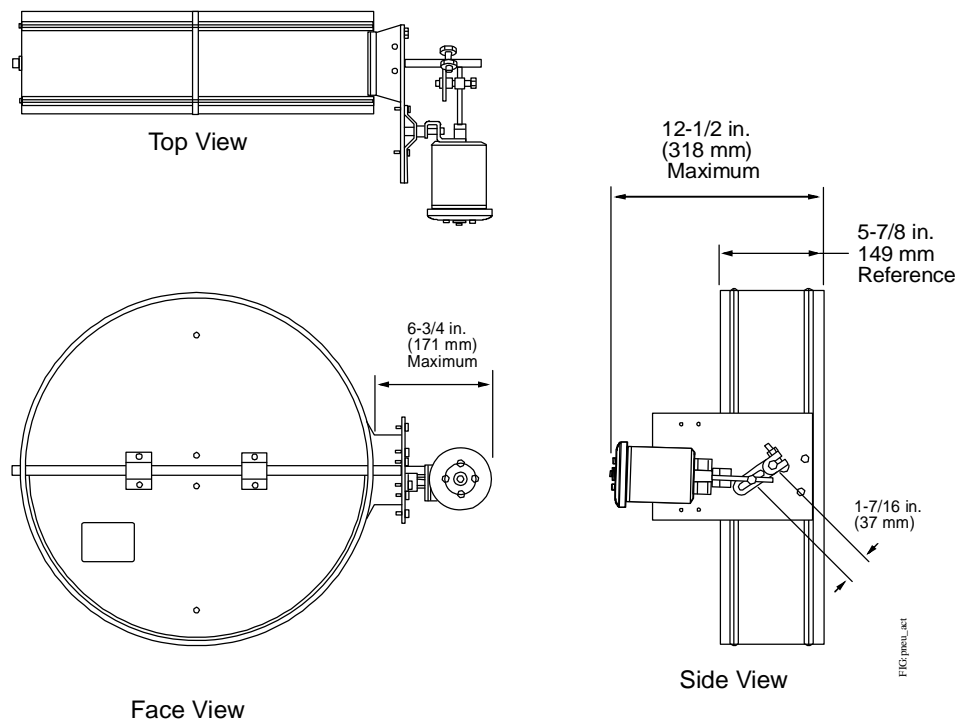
Damper with Pneumatic Actuator Dimensions, in. (mm)
